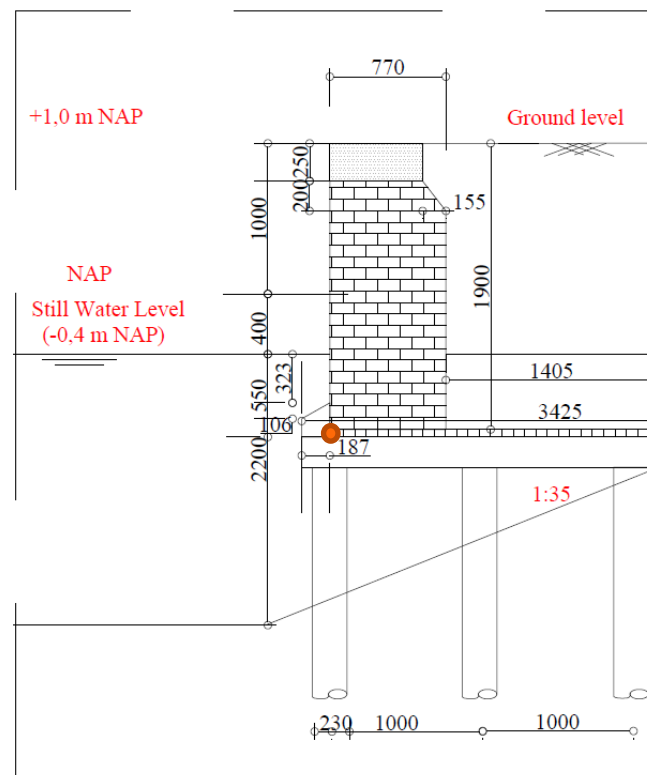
Principle cross section quay wall Amsterdam (own illustration)
